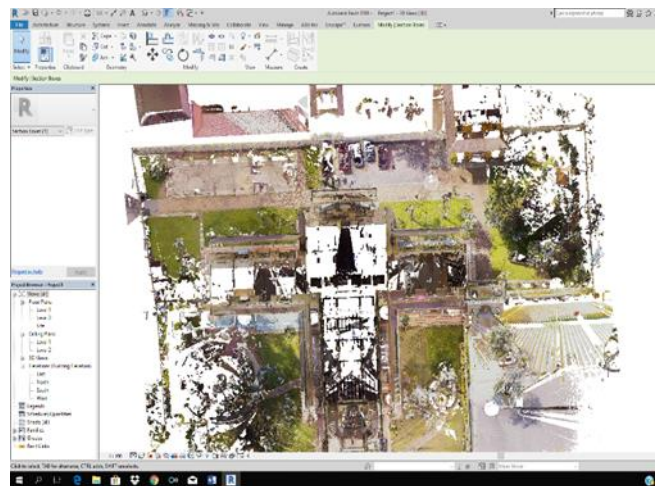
Layout floor plan of building (without roof) in Revit (Authors, 2019)
